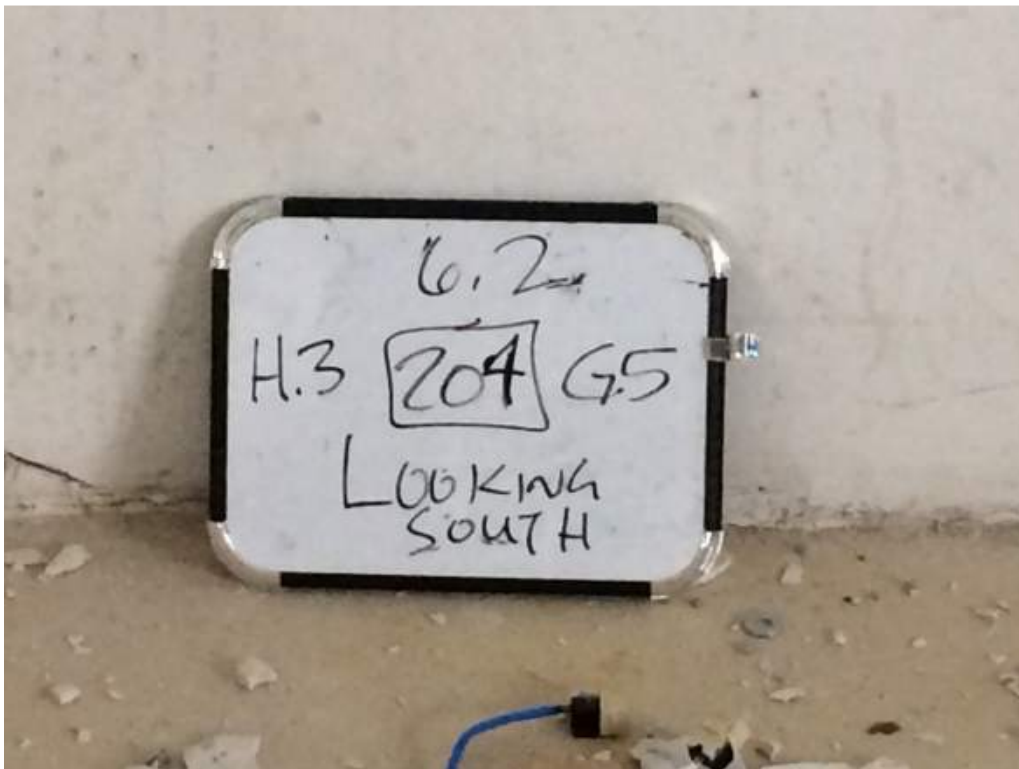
4th Floor – Room 204 –Along col Line 6.2 between G.5 & H.3 – Looking South –Crack @ bottom of CMU wall
